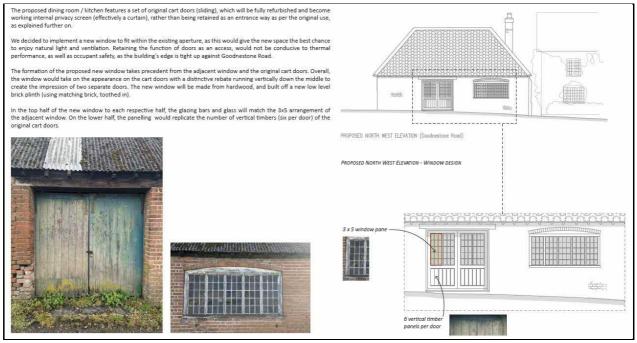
Extract from the Design and Access Statement – Evidence that considerable design expertise has been given to the detailing of the proposed replacement cart doors
